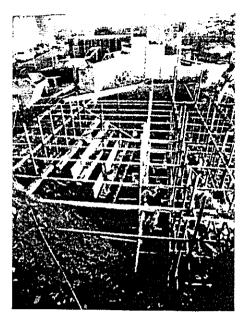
Carmarthen Castle: Area of Trench D with scaffolding, 1996
